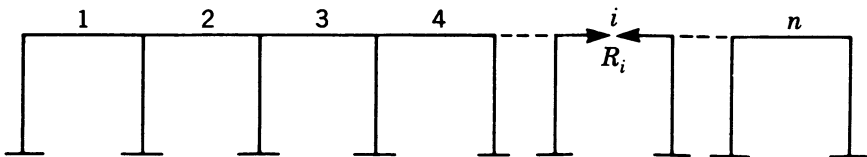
Effect of beam shortening in a frame composed of n beams and $n + 1$ columns with hinged beam-to-column joints.
